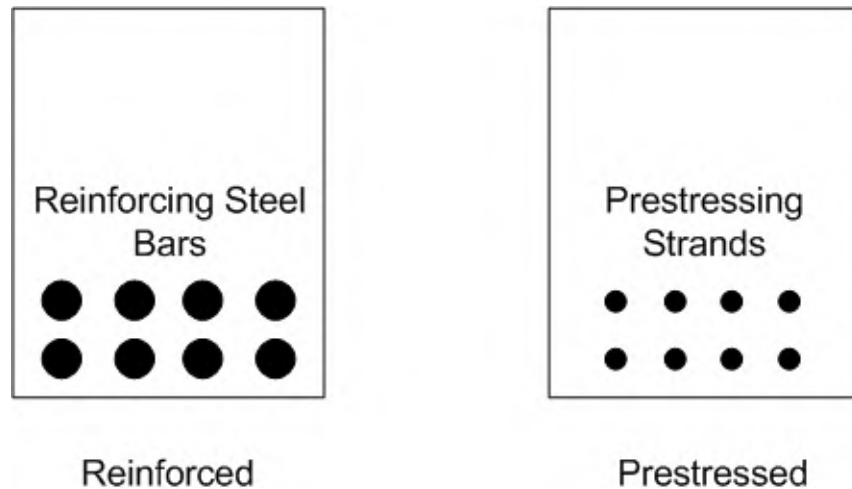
Non-prestressed Mild Steel Reinforced Concrete vs. Precast Prestressed Concrete
